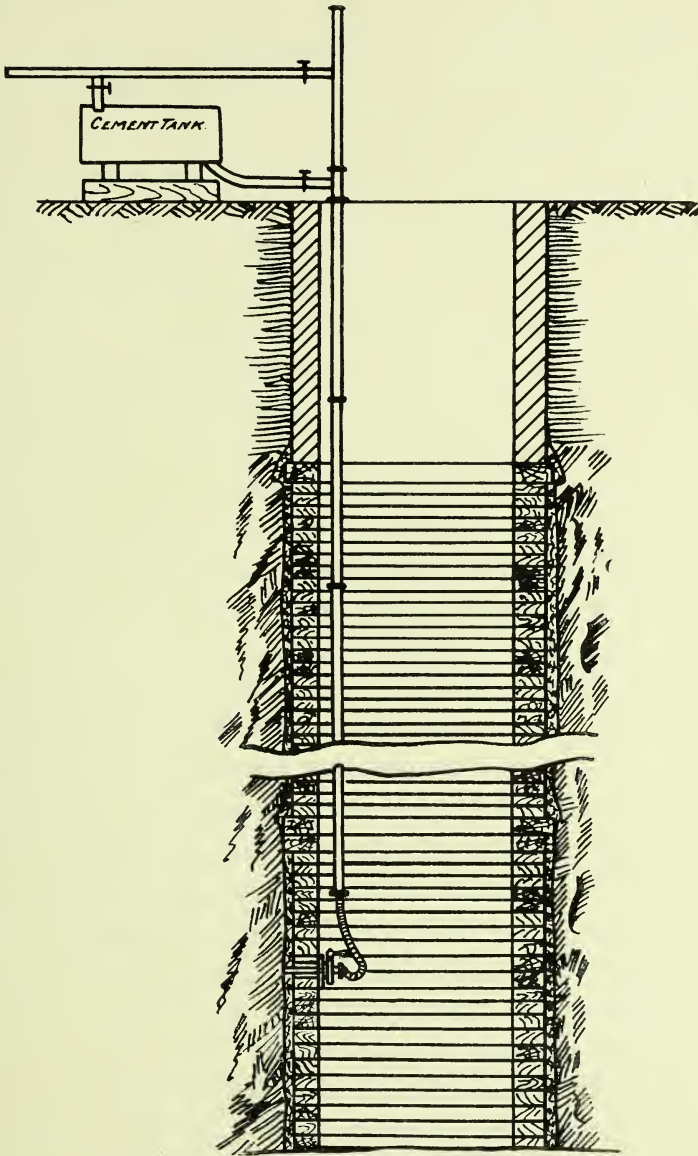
ORIGINAL PORTIER CEMENTATION PLANT.
